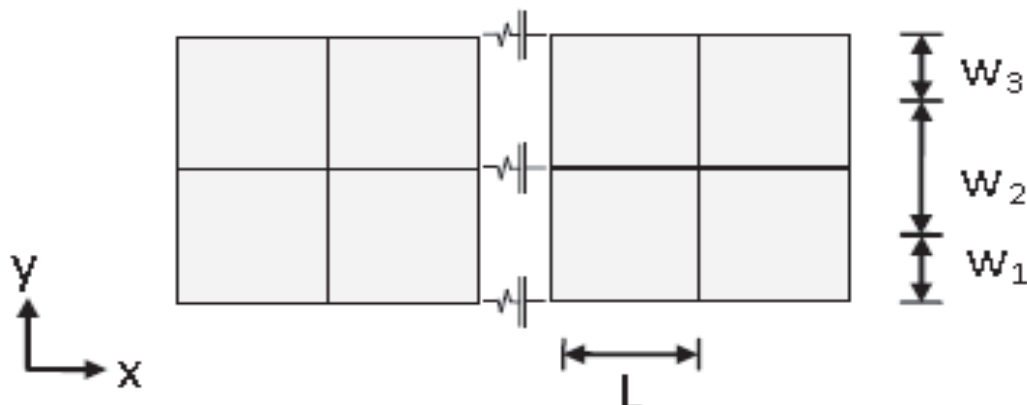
Shows the plan of two colliding floors showing axial element stiffness
